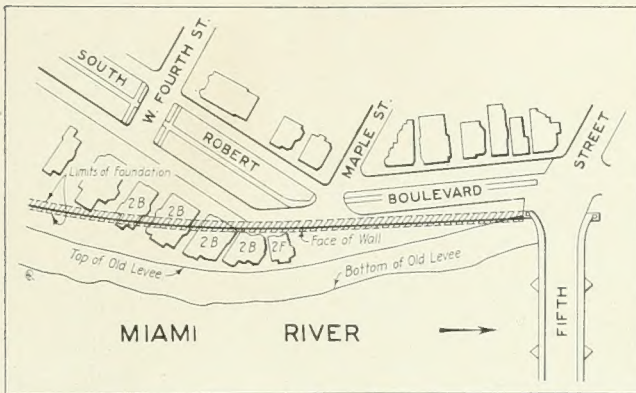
MAP OF ROBERT BOULEVARD WALL.
